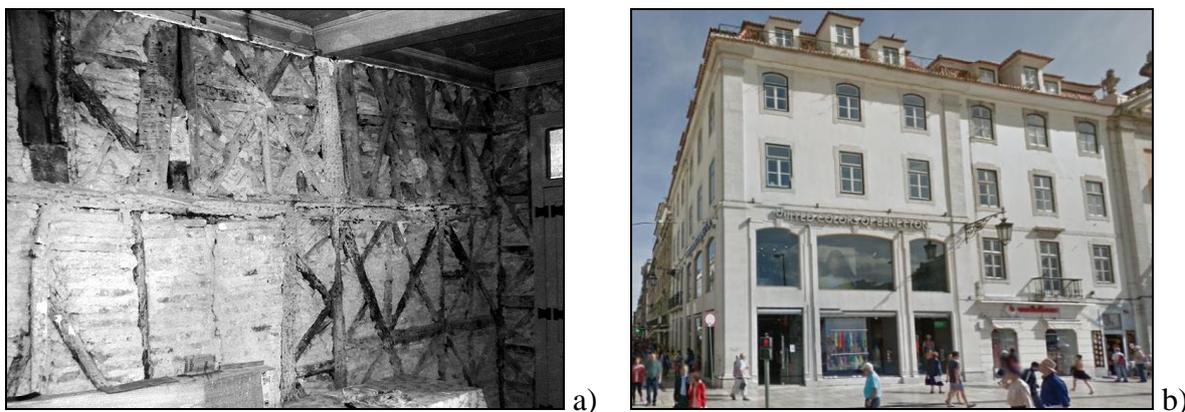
Traditional “Pombalino” buildings in Lisbon: a) removal of a masonry wall, replaced by a steel H shape steel beam; b) total rebuilding of the first floors to create a commercial open space producing the masonry wall-piers discontinuity on both façades of a “Pombalino” corner building.
